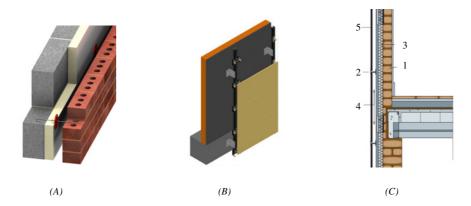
Façade cavity systems (A) Cavity wall (B) ventilated façade (C) elements of ventilated façade.
